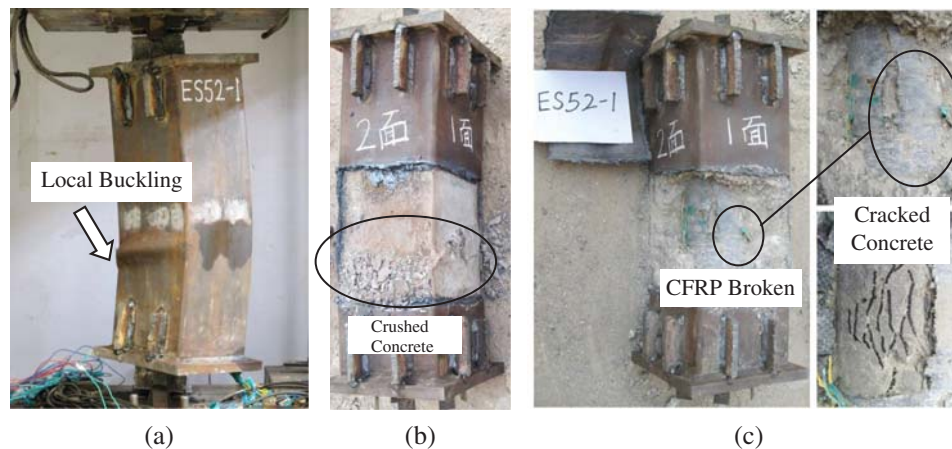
The failure mode of compressive zone of HCFSSST-CFRP stub column (a) steel tube (b) sandwich concrete (c) CFRP and inner concrete
